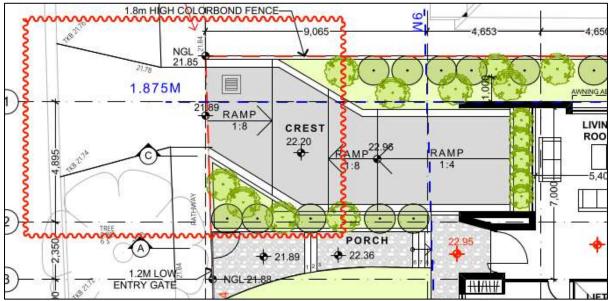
Amended ground floor plan showing amended driveway location/design and increased separation from street tree.
